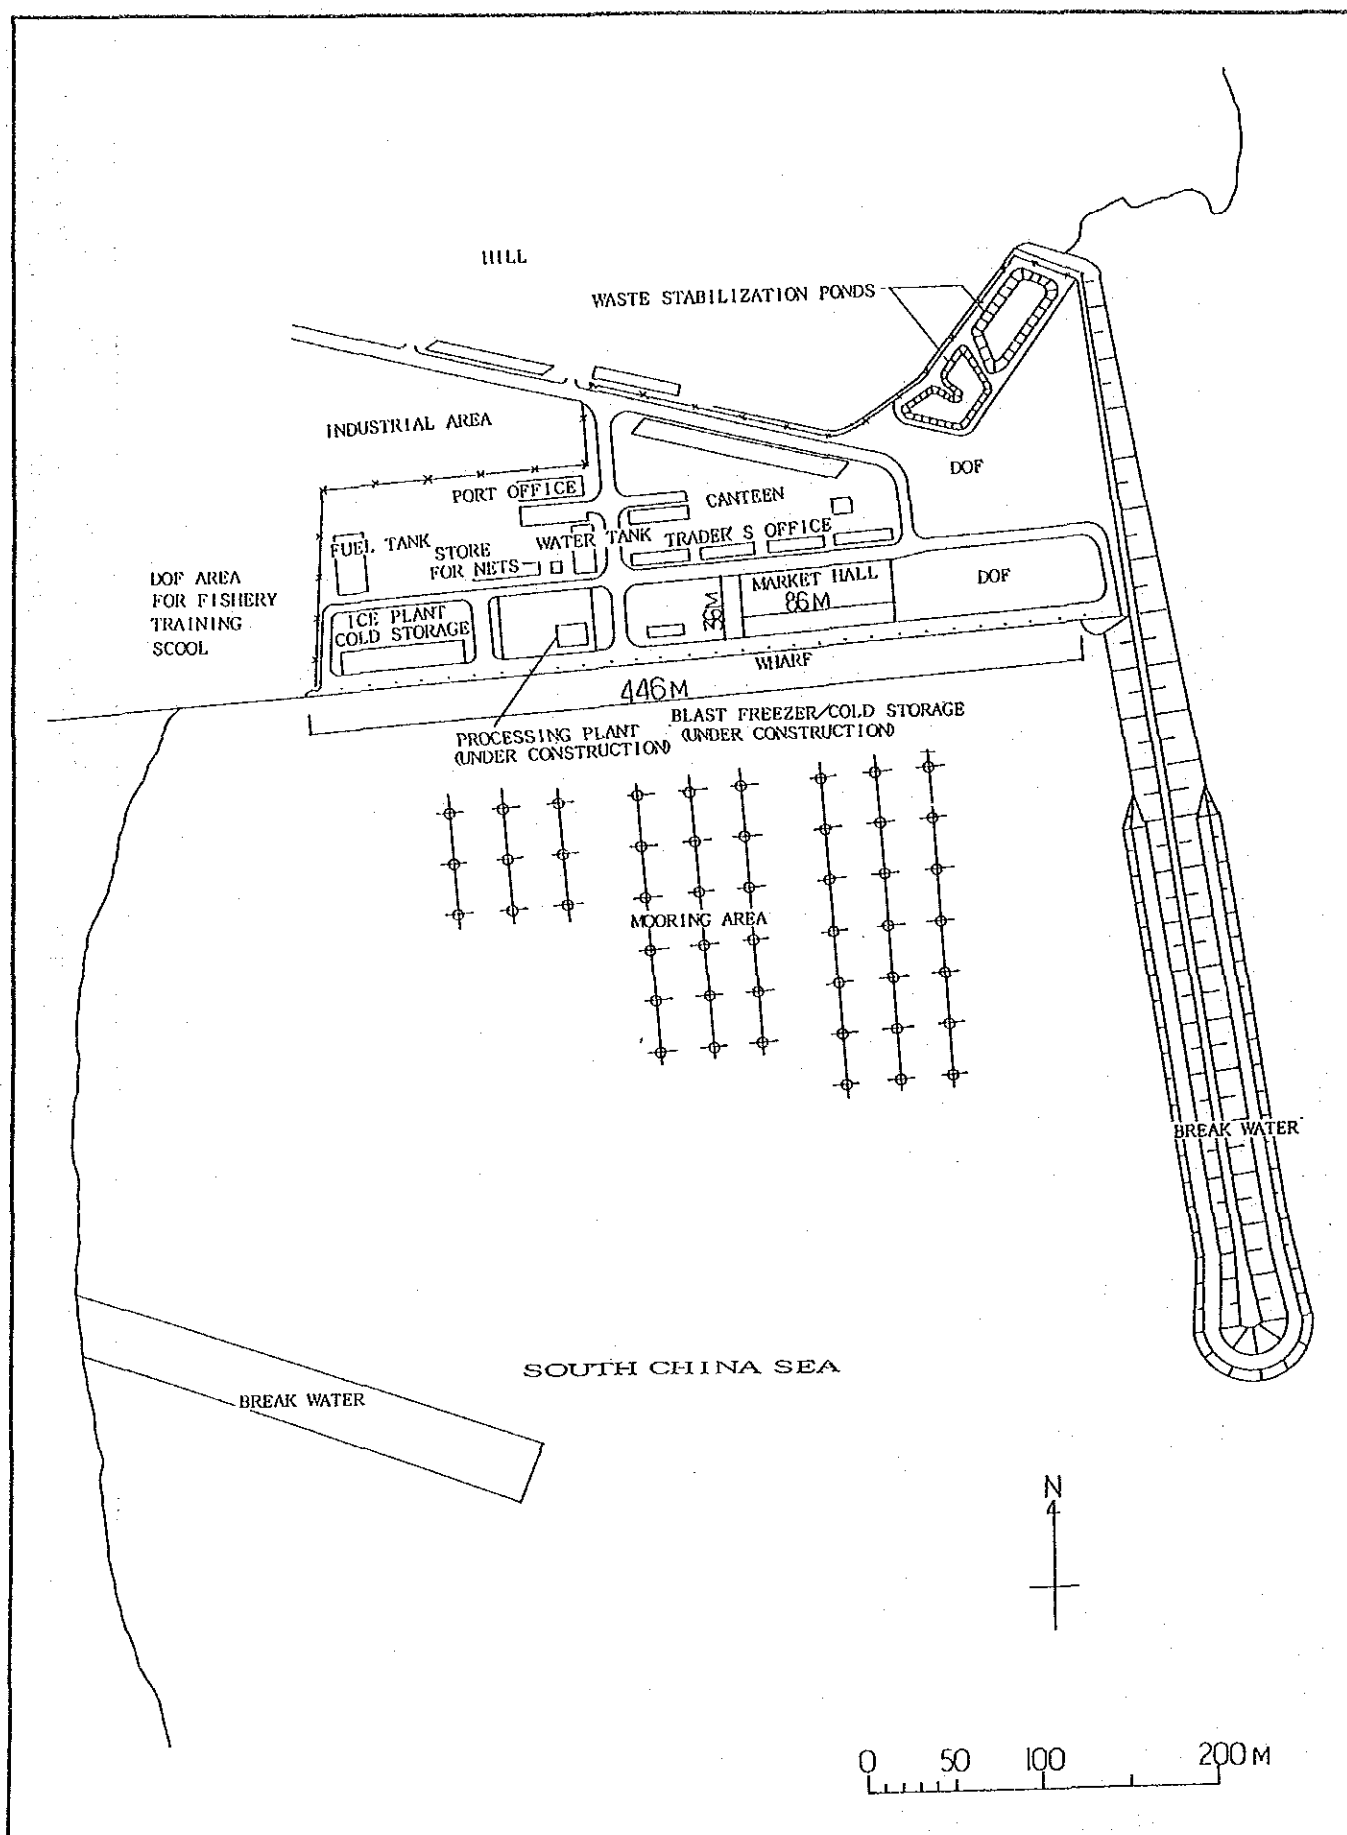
General Layout Plan of LKIM Complex of Chendering
